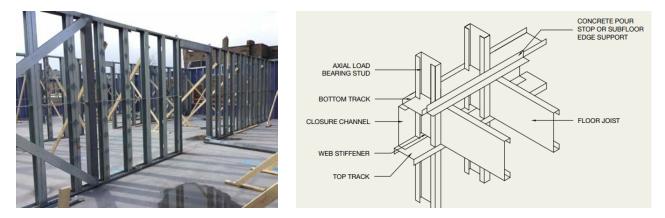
CFS system in platform-type construction (left) (summitdb.com, 2021) and schematic detail for platform-type construction (right) (Cssbi, 2002)
